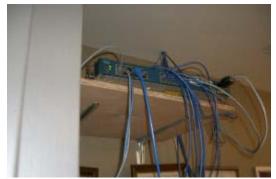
Cable is distributed from an equipment location through a hole in the ceiling and to outlet locations.
